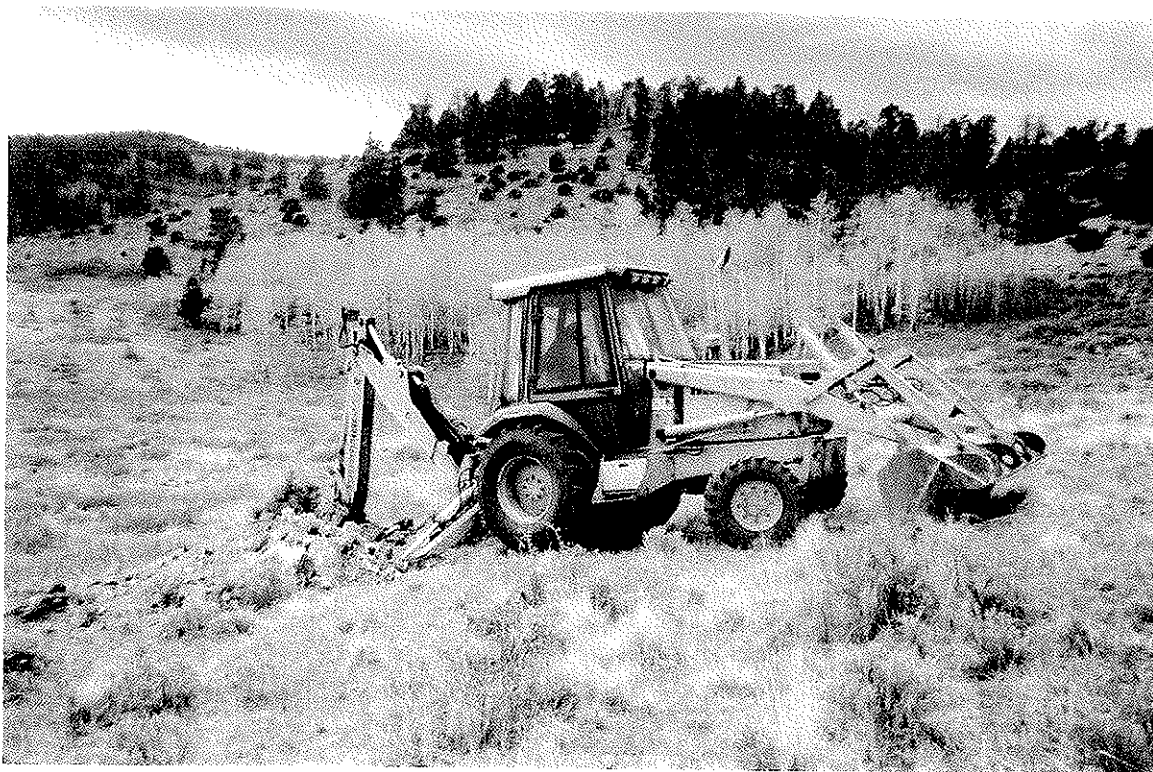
F7 Vein. Backhoe trenching T1S trench. View -> NW at Precambrian hills in background.
